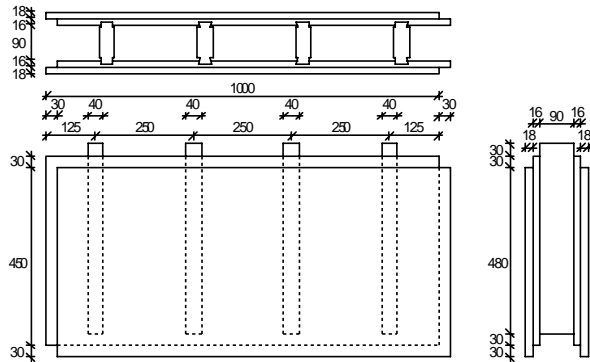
Scheme of Prefabricated Timber Wall Element, dimensions in mm
